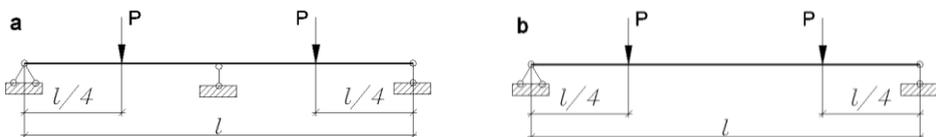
A double-span beam loaded with two concentrated forces in the middle of the span: a - the original structure; b - damaged construction
